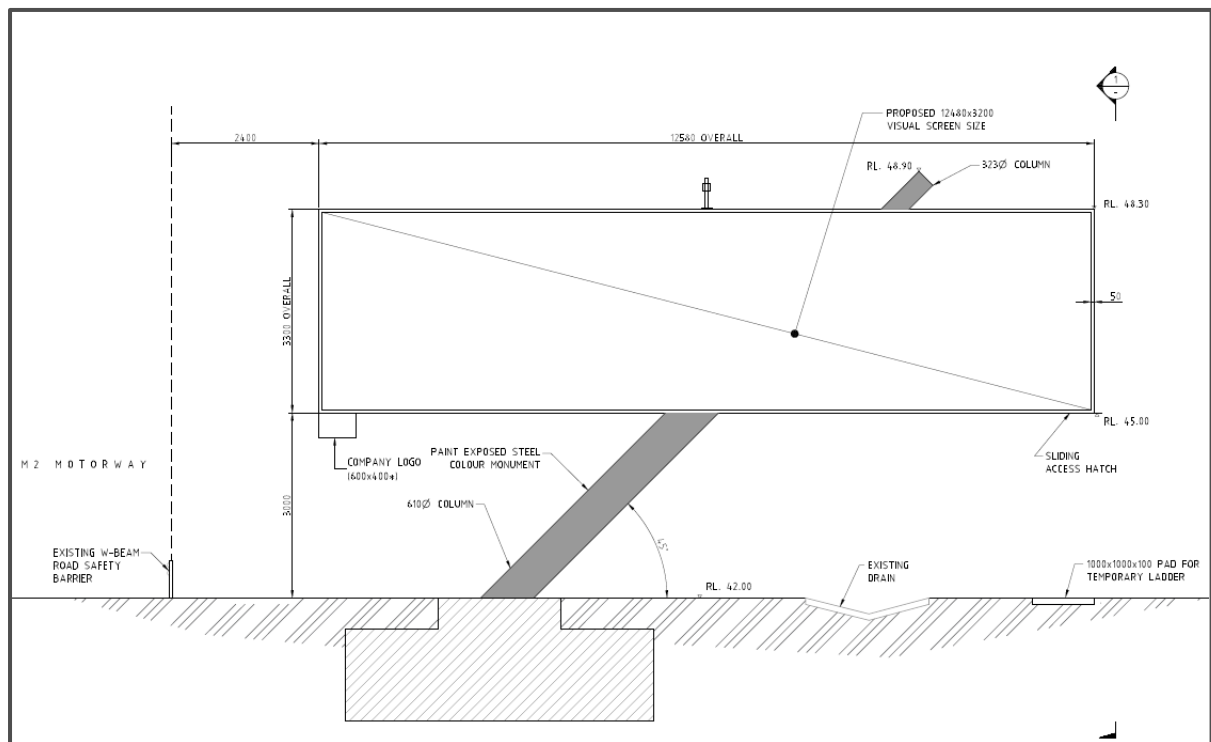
| Elevation (source: Applicant's Engineering Plans)
